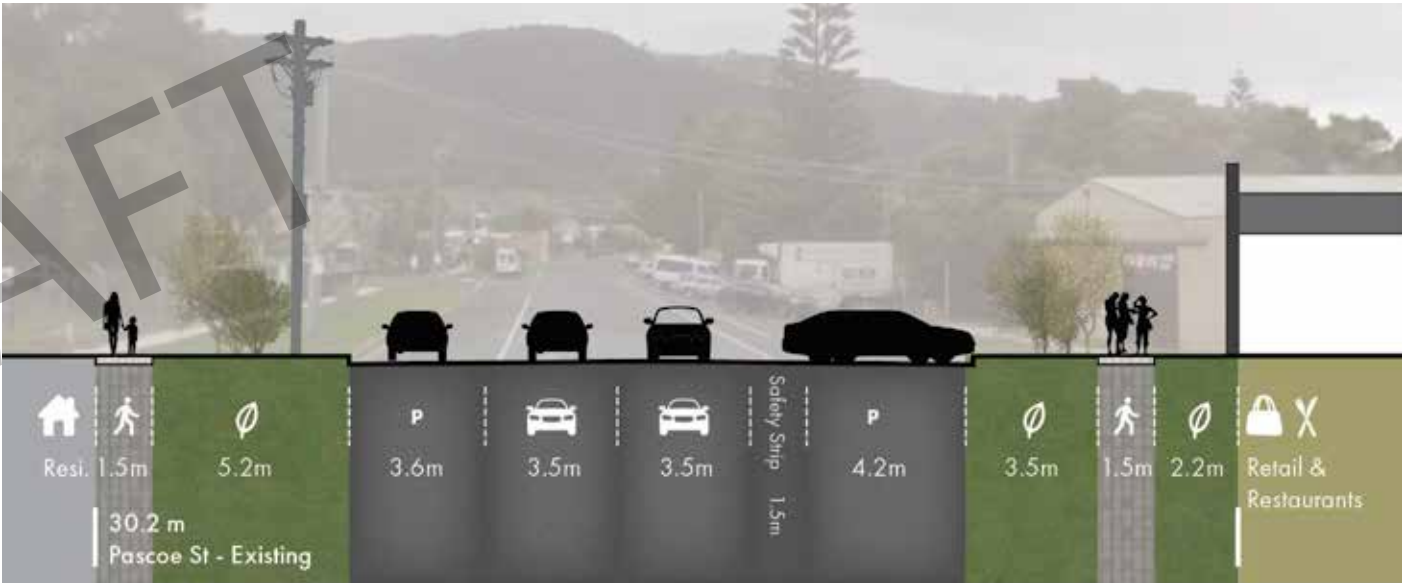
Pascoe Street B-B' (Between Hardy St And Moore St) - Existing Cross Section
